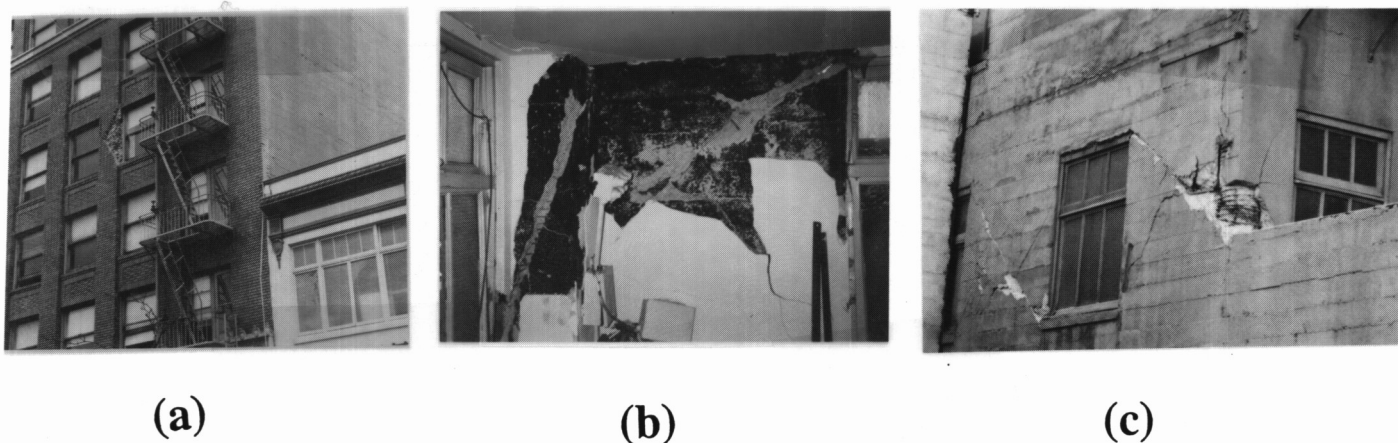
Damage of 7-Story Building: (a) Brick Facade above Pounding Level, (b) Wall-A and Column-A (Inside View), and (c) Wall-A and Column-A (Exterior View).
